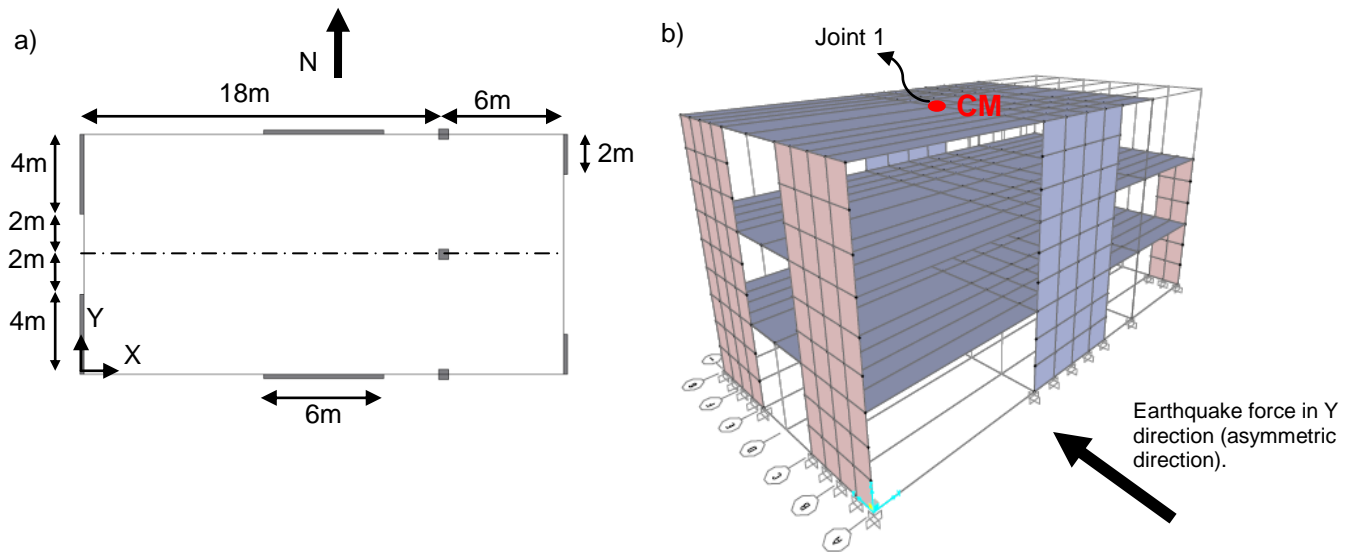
Case study of irregular building: a) plan view; b) 3D view
